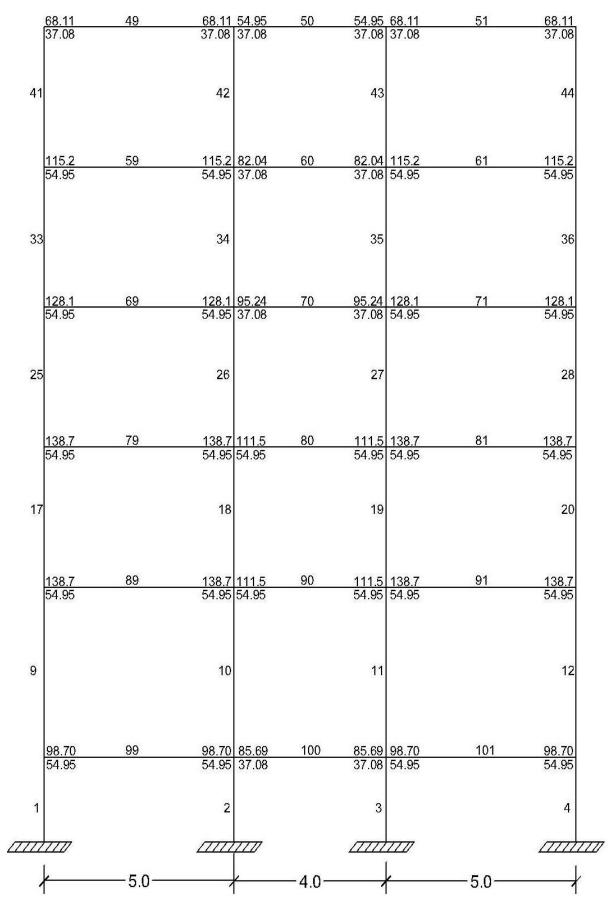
Moment capacity of beams for provided reinforcement in beams
